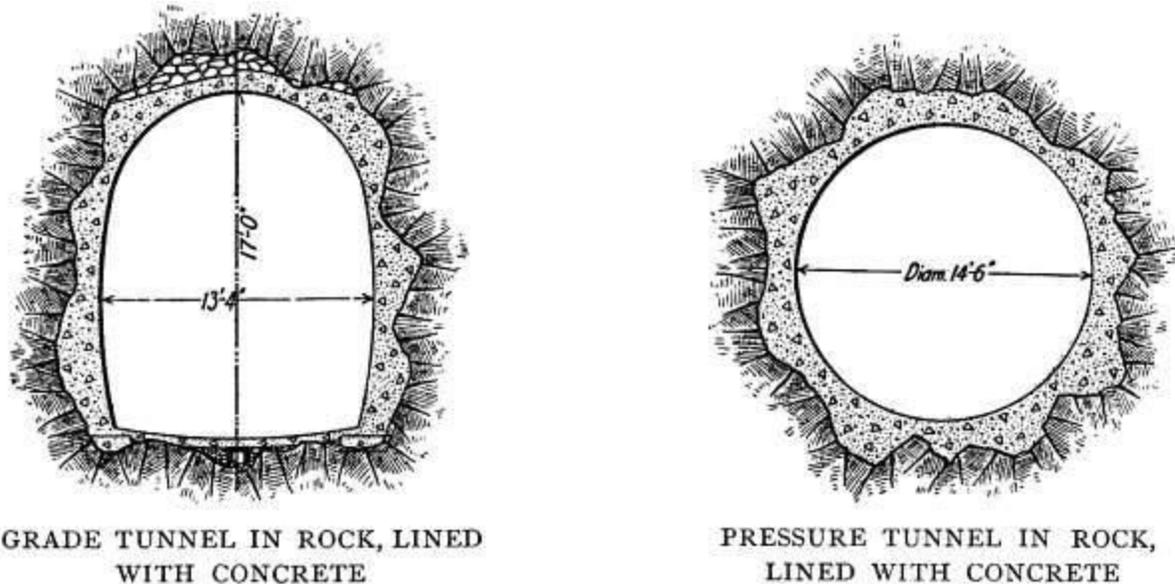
Grade tunnel example are to the left and Pressure tunnel to the right. Grade tunnels are typically 13'-4" wide and 17'-0" tall. These tunnels were also lined with concrete and surrounded by earth. Grade tunnels due to design for optimal pressure and water flow had a typical diameter of 14'-6". [5][7]
